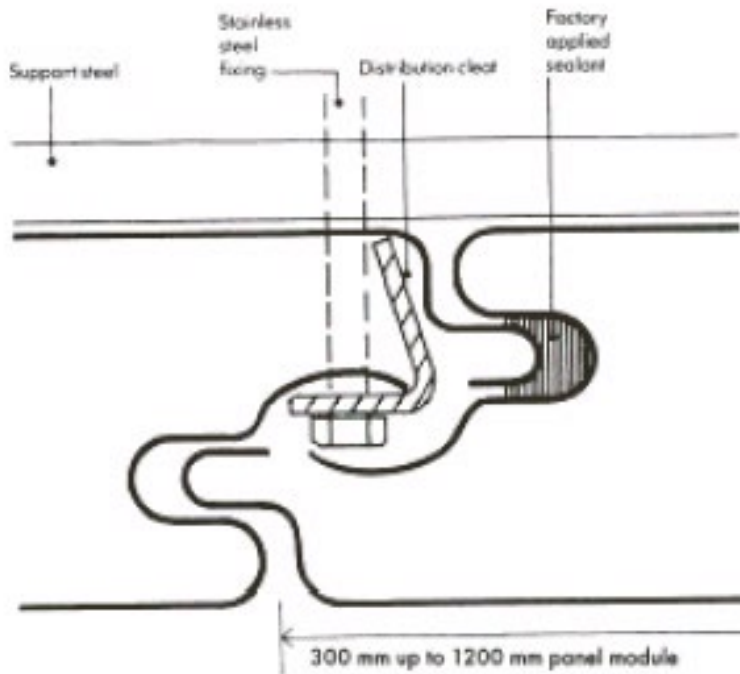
More pronounced, overlapping rolled tung and groove panel joint profile observed for some cladding insulated panels (not tested)
